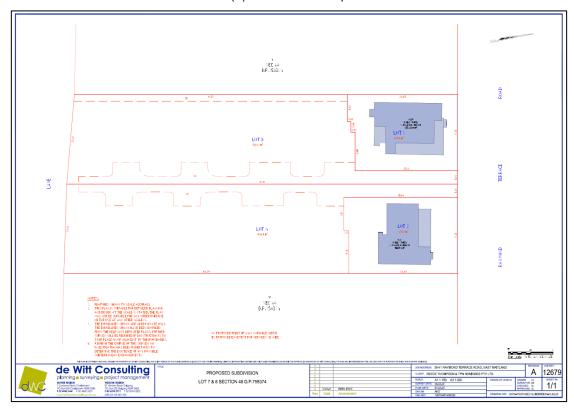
Plan of Proposed Subdivision (source: de Witt Consulting)
